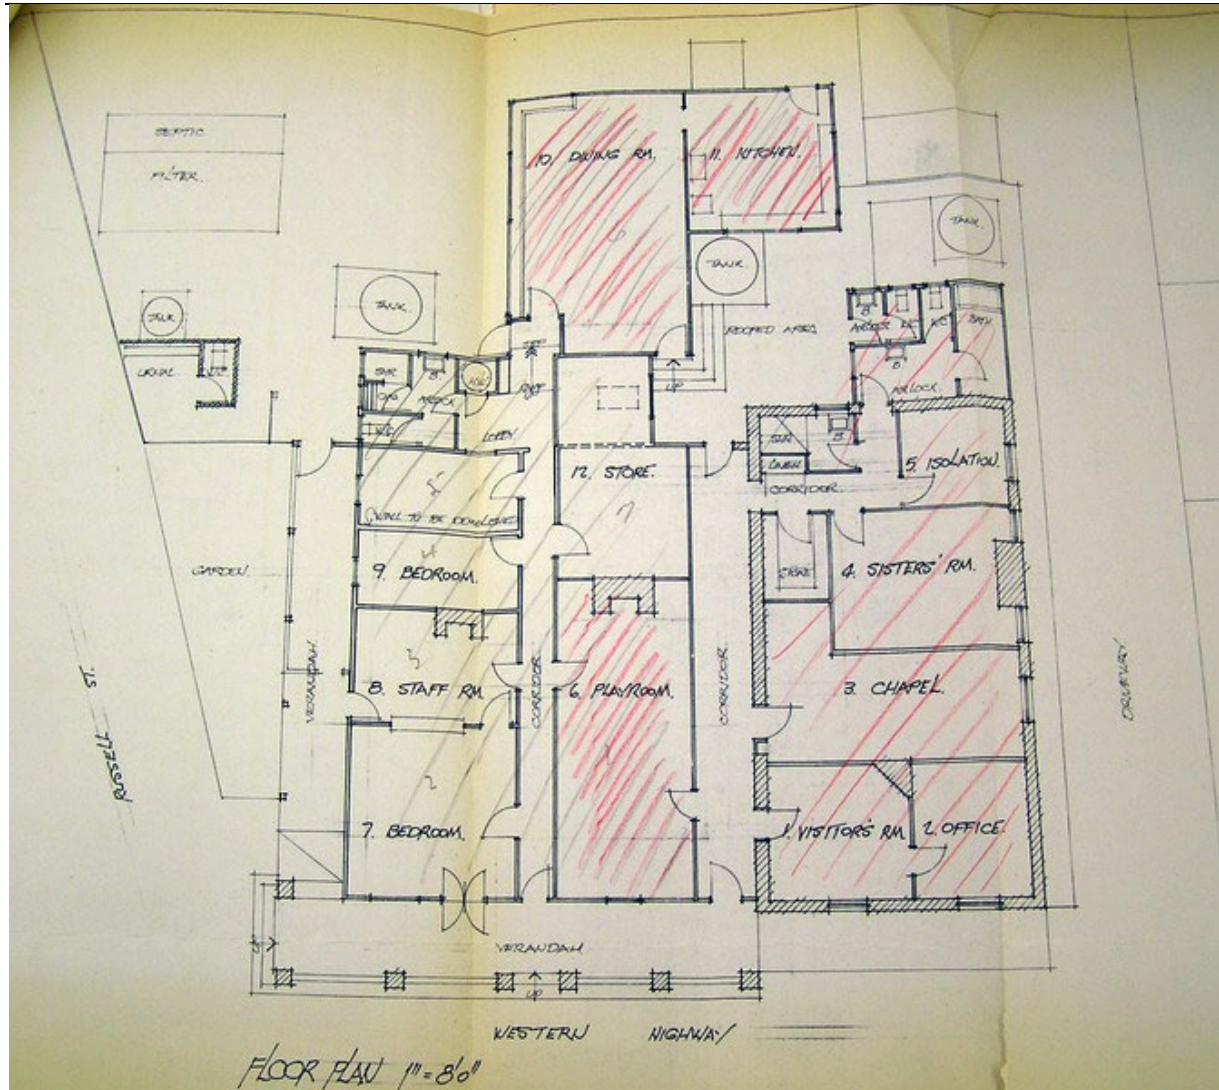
Floor plan of former hotel showing proposed conversion into a Children's Home, 1973.
